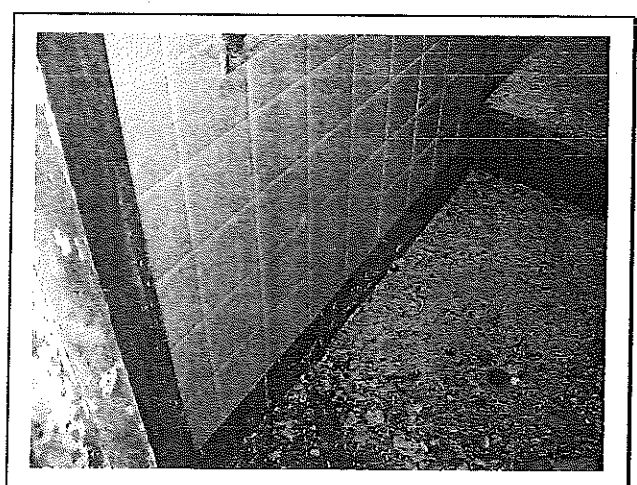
Viewing peach 4" wall tile and black tile trim, Throughout building.
